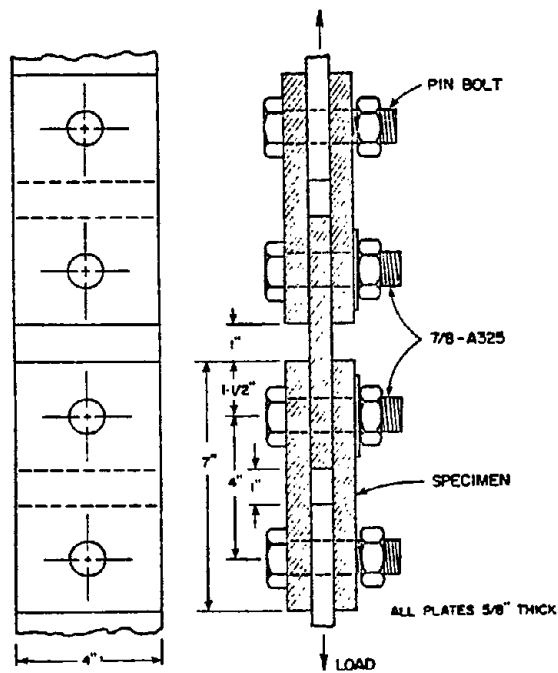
Bolted tension slip specimen (1 in. = 25.4 mm)
